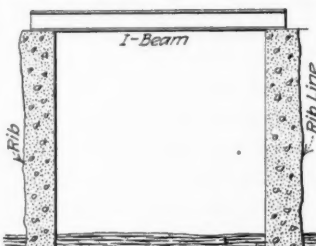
I-BEAM BAR ON CONCRETE WALLS
